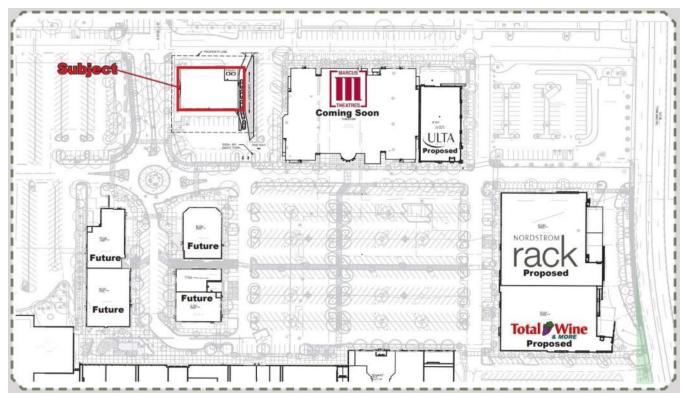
Map of Proposed and Future Development on Mall Site, with Former Pier1 Site Highlighted
